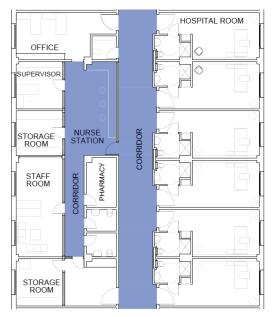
Plan view of corridors leading to hospital rooms and to a nurse station.
